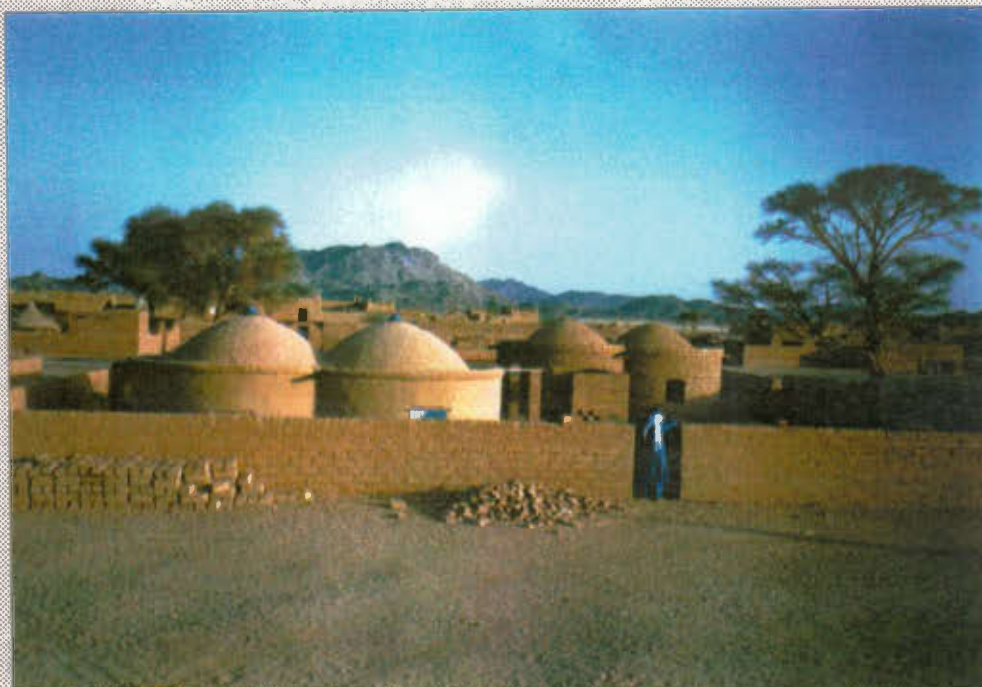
Private houses (2 round rooms, with domed roofs) built by Moussa Amgar and his team, Iférouane. (For actual costs of these buildings, see page 32, House type 2.)
